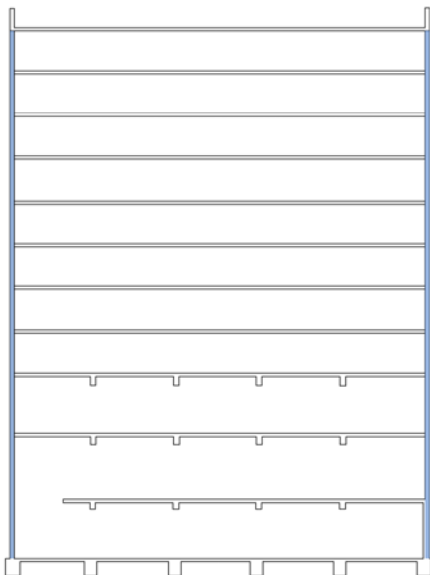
Elevation Looking West with Lateral Elements Highlighted (in blue)
